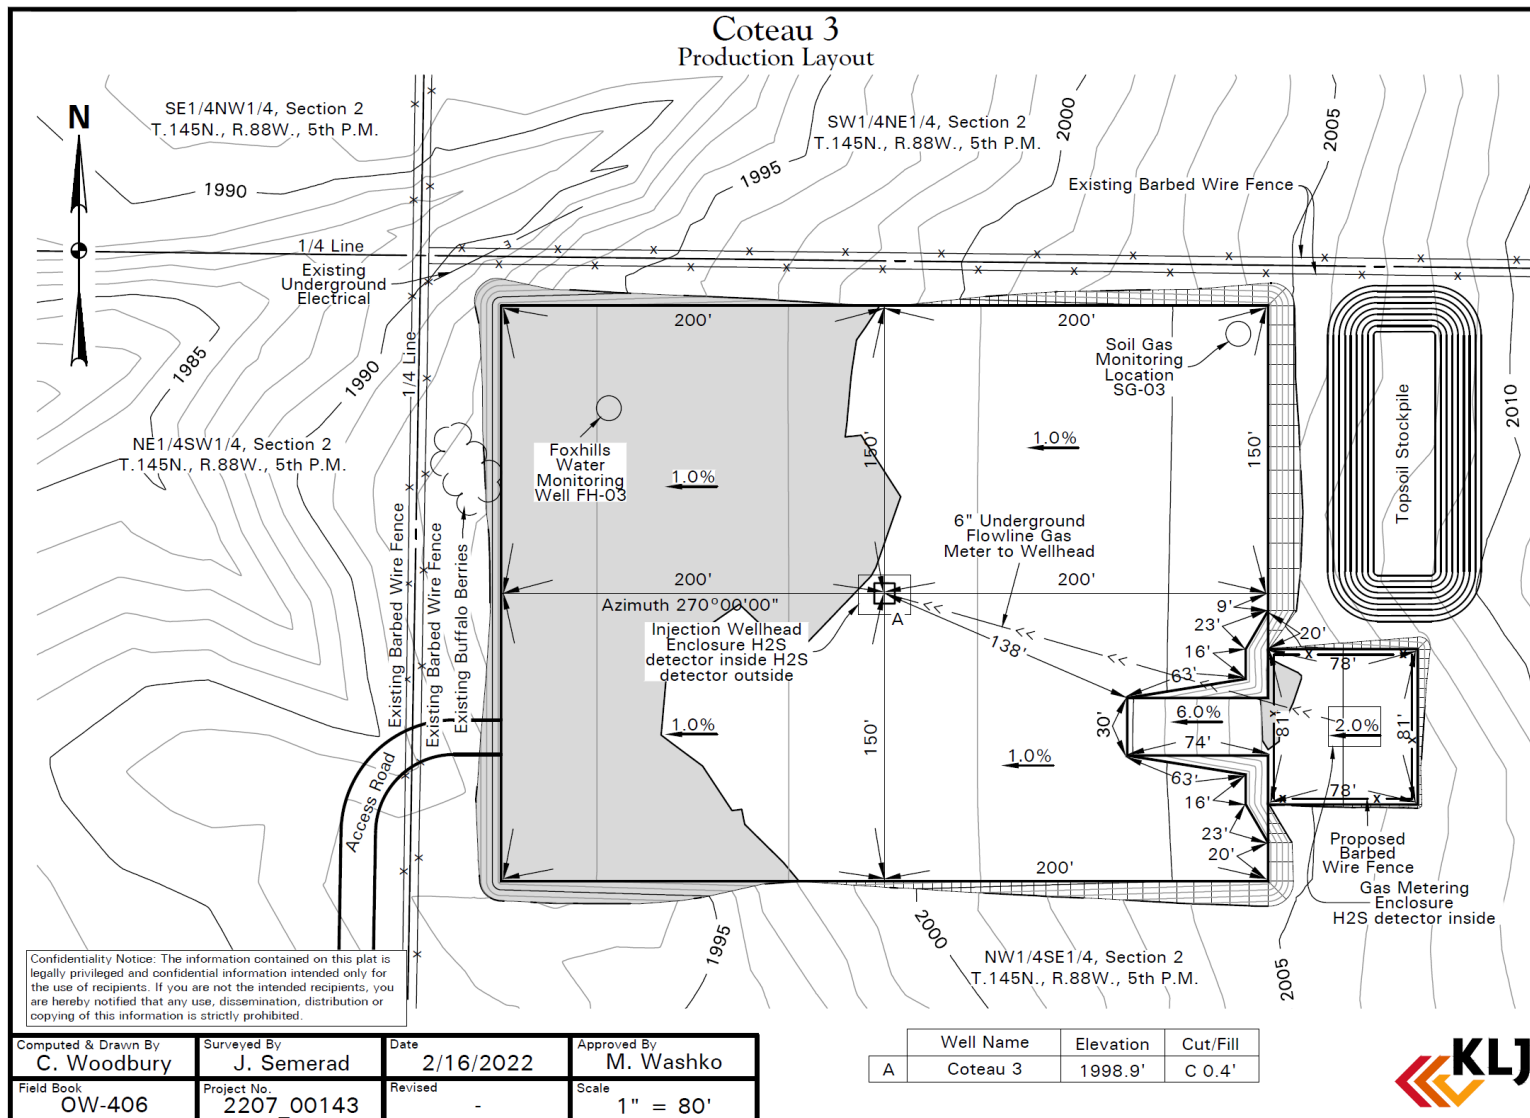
C. Well pad drawing of the Coteau 3 well location.
